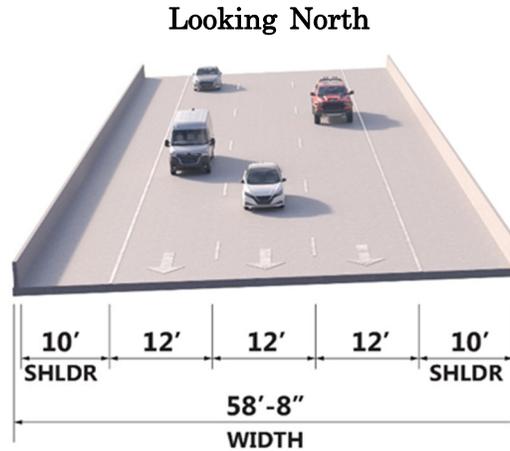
Proposed Southbound US 41 Bridge over SR 597 (N. Dale Mabry Highway) Typical Section
